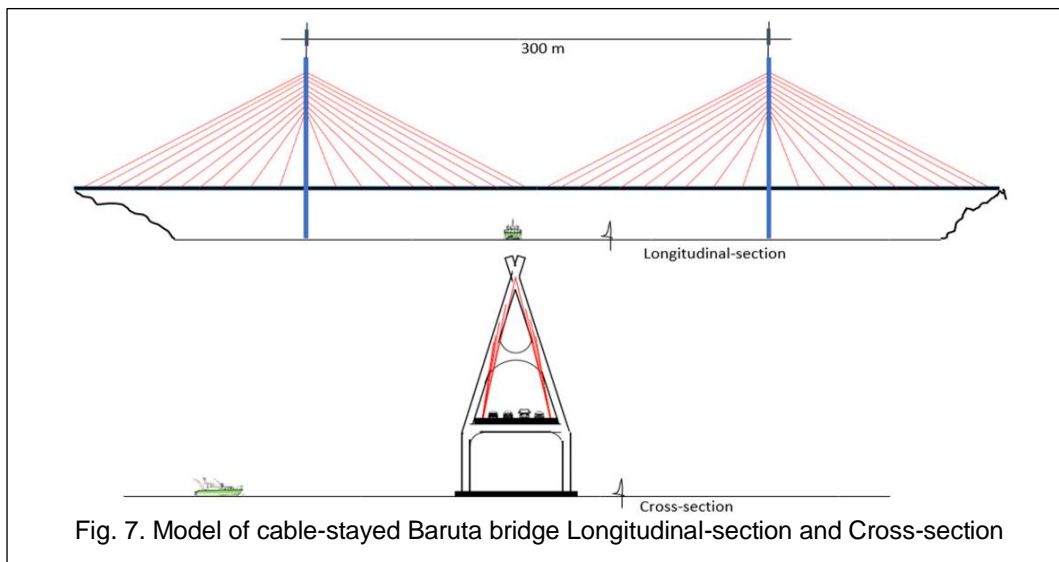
Model of cable-stayed Baruta bridge Longitudinal-section and Cross-section
